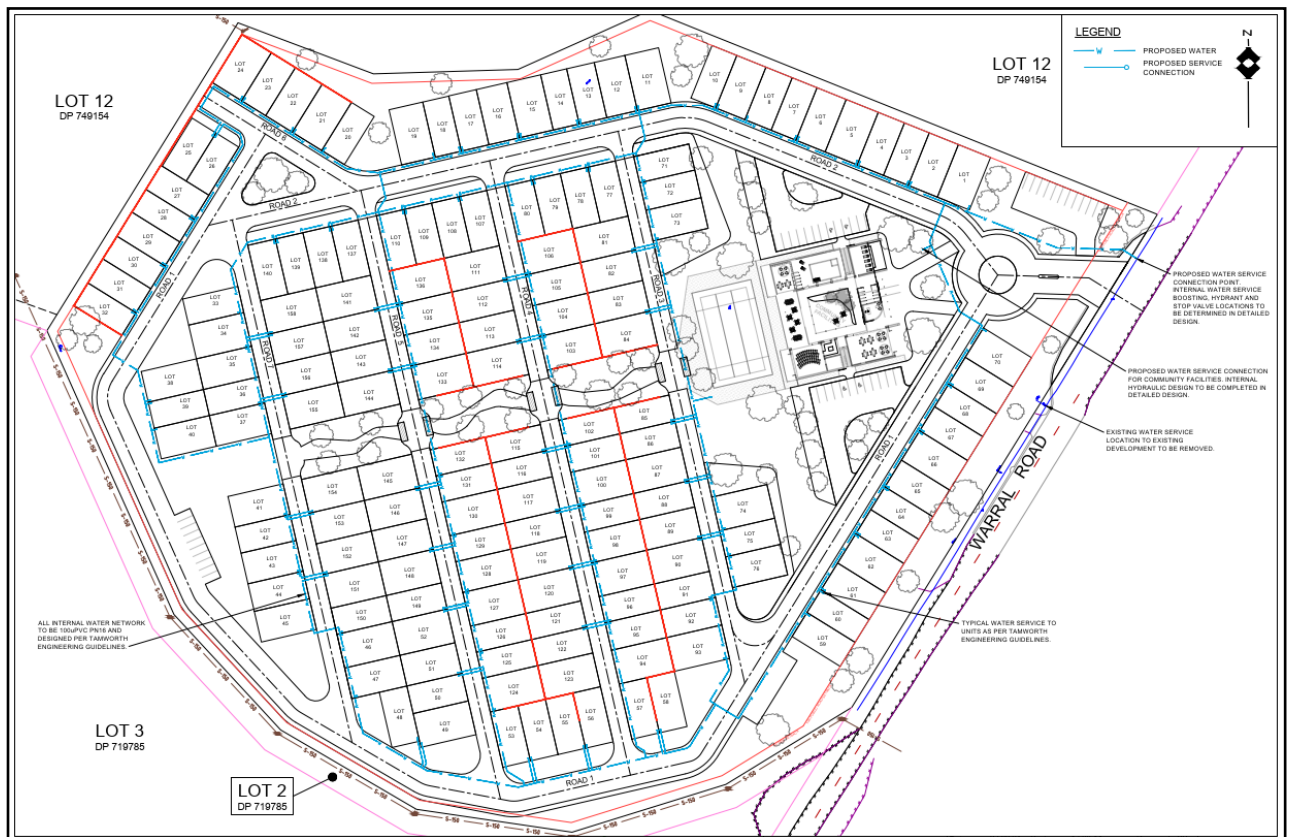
; Extract of proposed development plans ex High Definition West Pty Ltd
